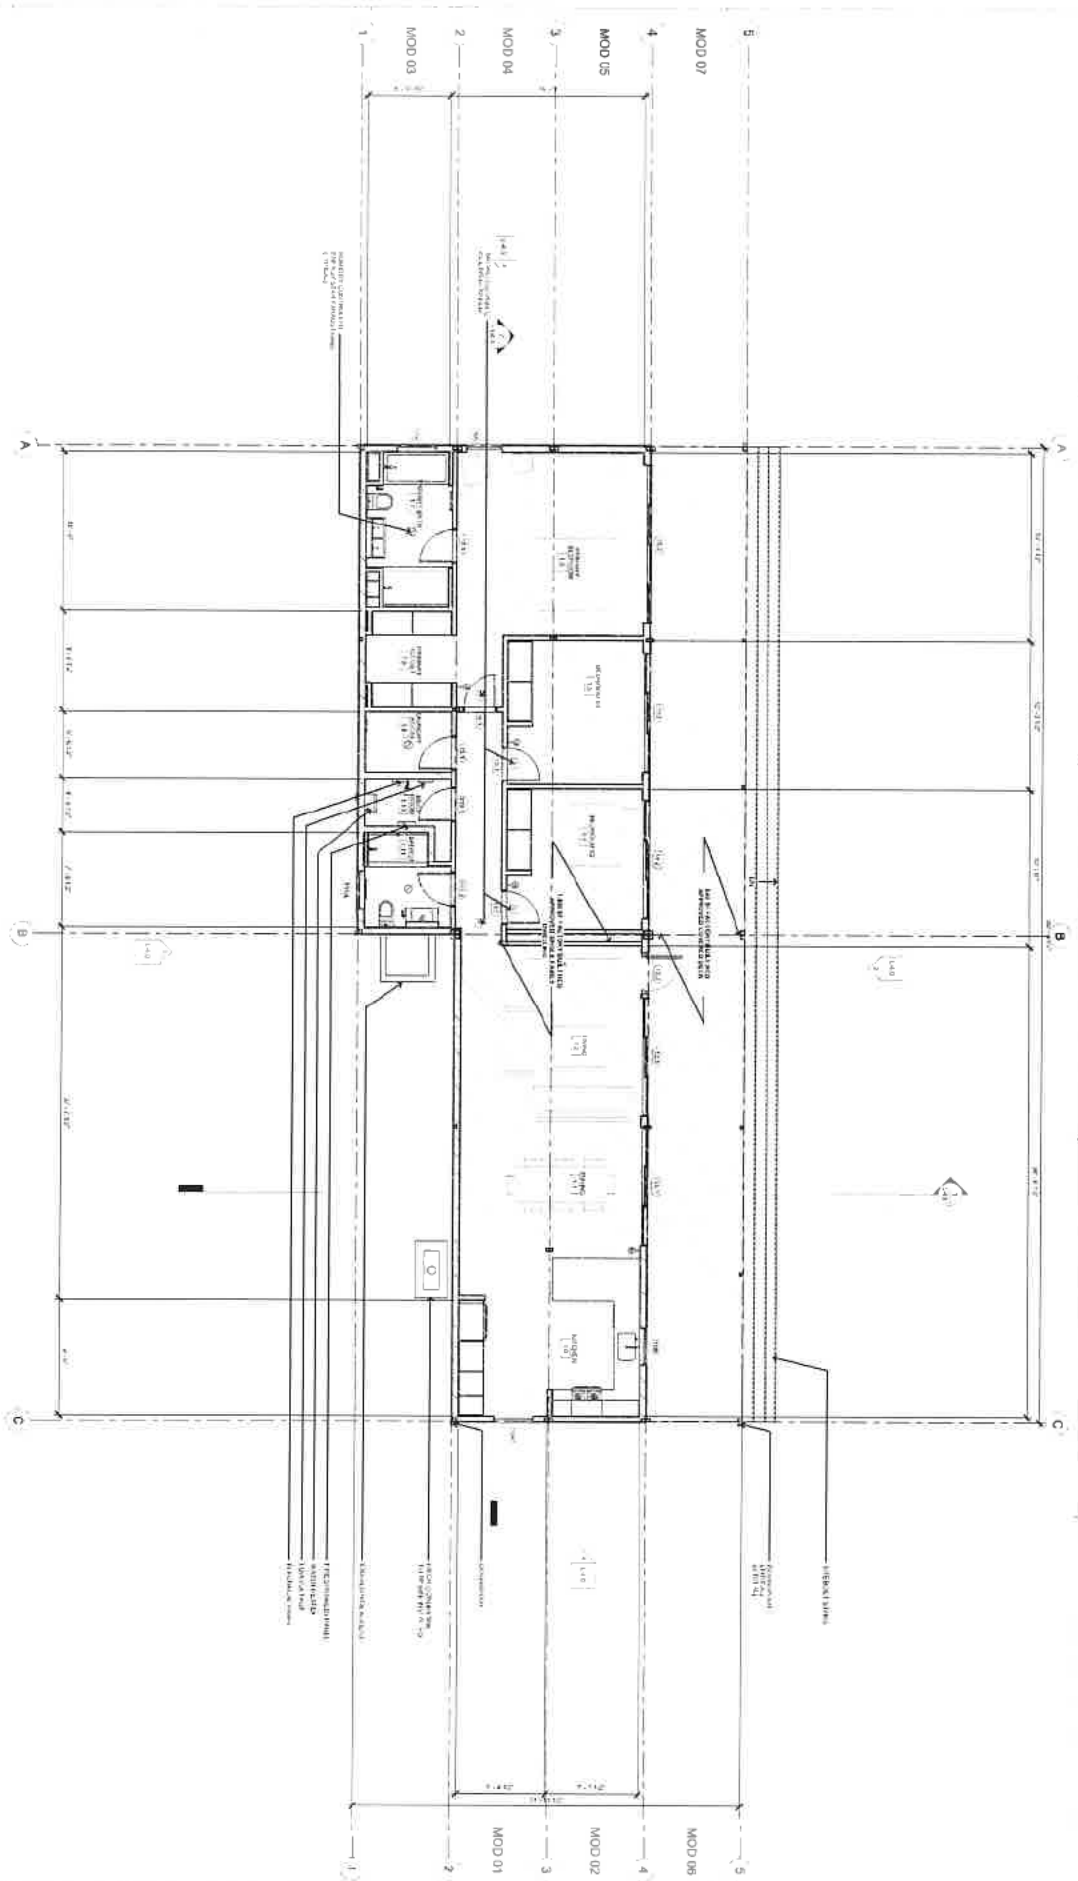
FLOOR PLAN - 1/8" = 1'-0"
